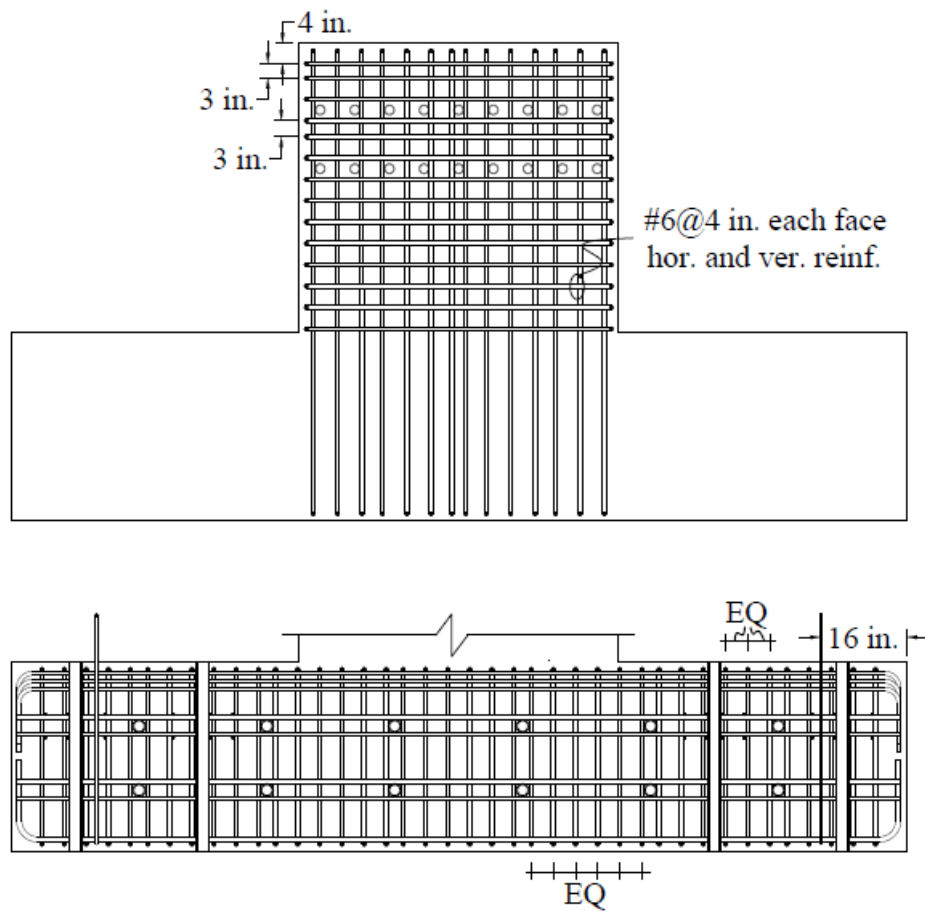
Rebar layout for specimen with 2% web reinforcement (Walls 2 and 3)
